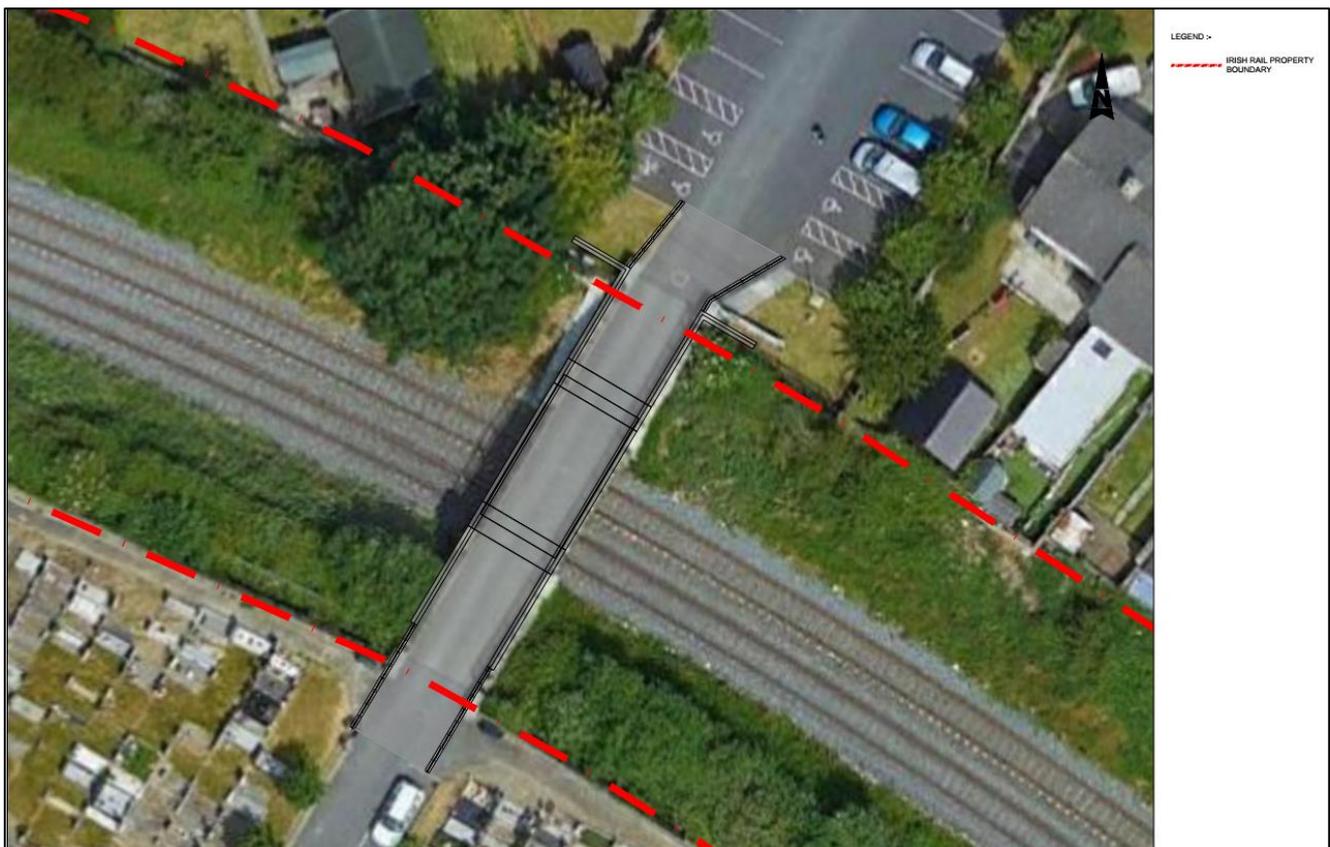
Existing layout of Glasnevin Cemetery Road Bridge (OBO10)
